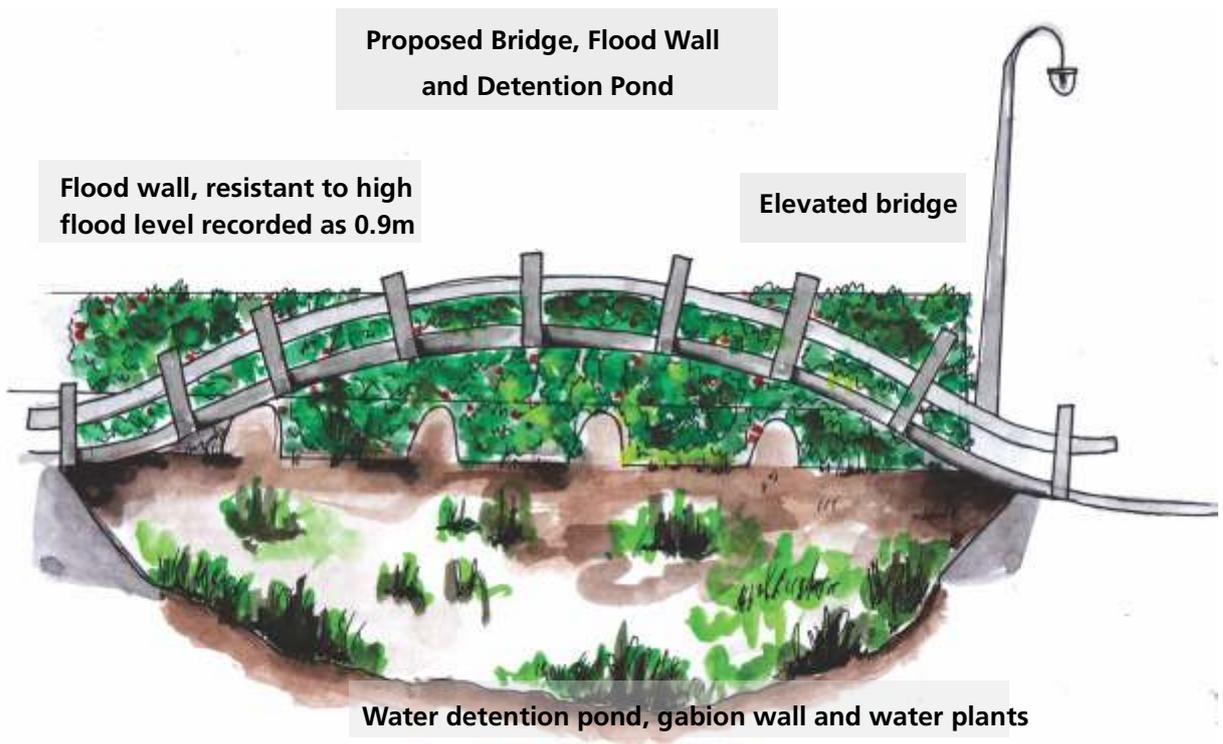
Flood wall, Bridge and Water Detention Yard – cross section
